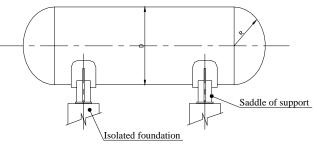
Horizontal pressurized storage steel tank and summary table of structural parameter.
